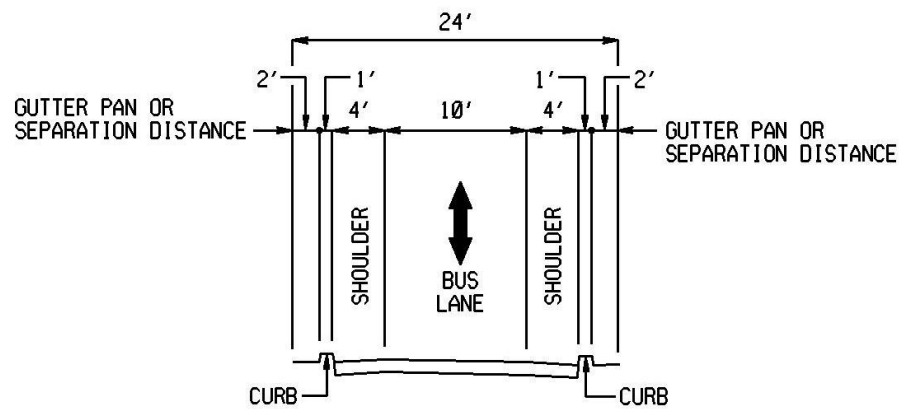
Cross-sections of possible BRT guideway treatments
